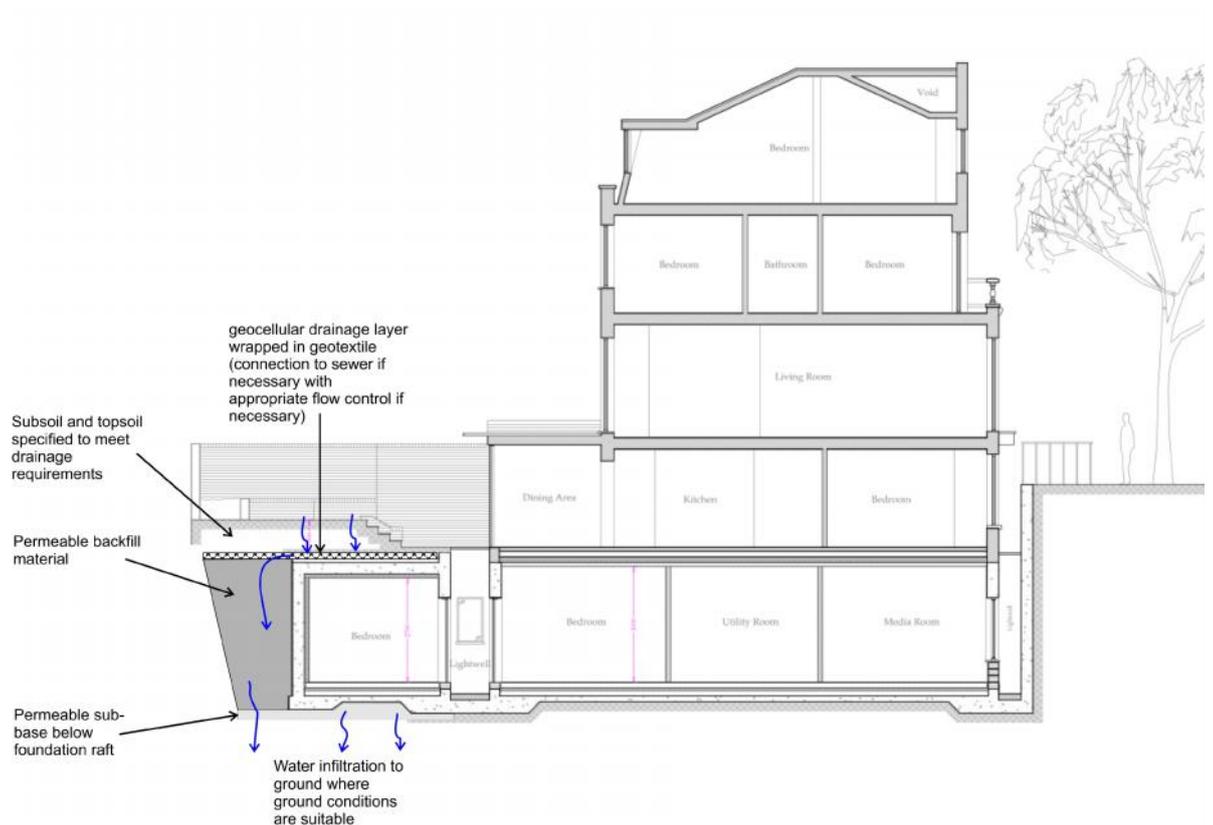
Example layout of an infiltration blanket for basement roof runoff
